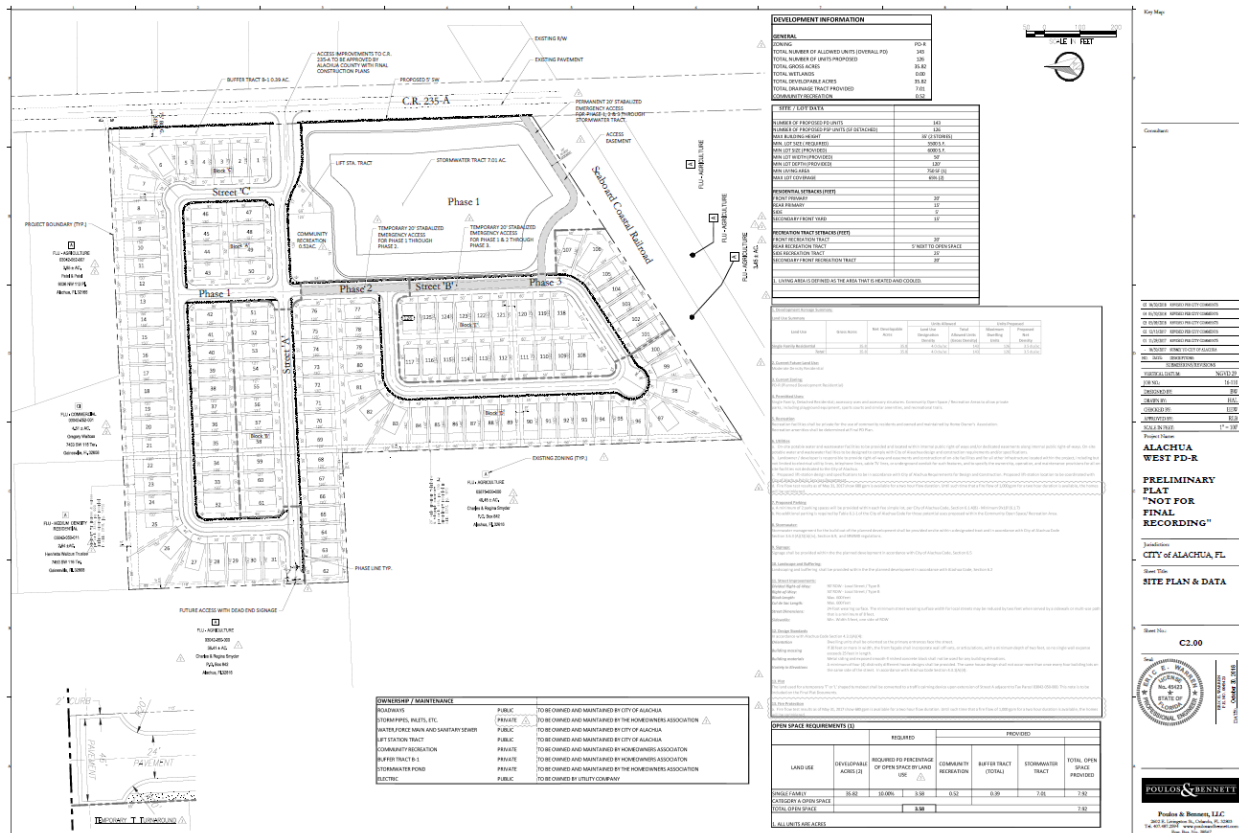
Alachua West PD-R Preliminary Plat & Final PD Plan (Sheet 2.00)
